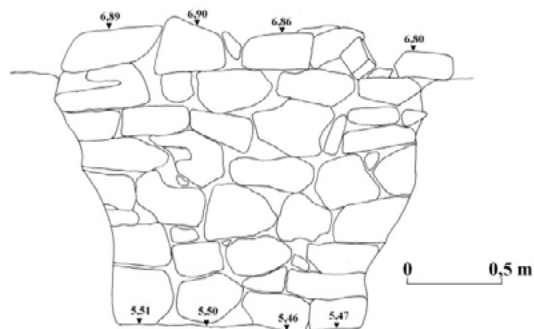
SECTION OF THE NORTHERN FACADE OF THE SOUTH-WESTERN DEFENSIVE WALL
